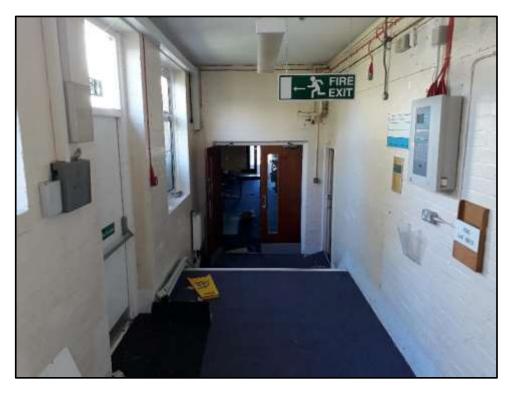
Library building, link corridor with painted brickwork wall and steps to address changes in level between the two ranges (facing north east)
